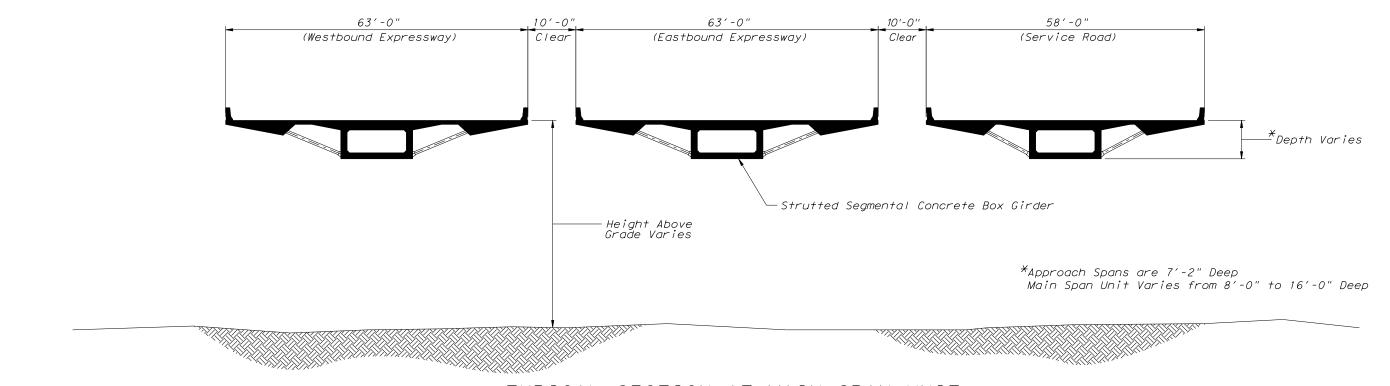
SEGMENTAL CONCRETE BOX GIRDER
